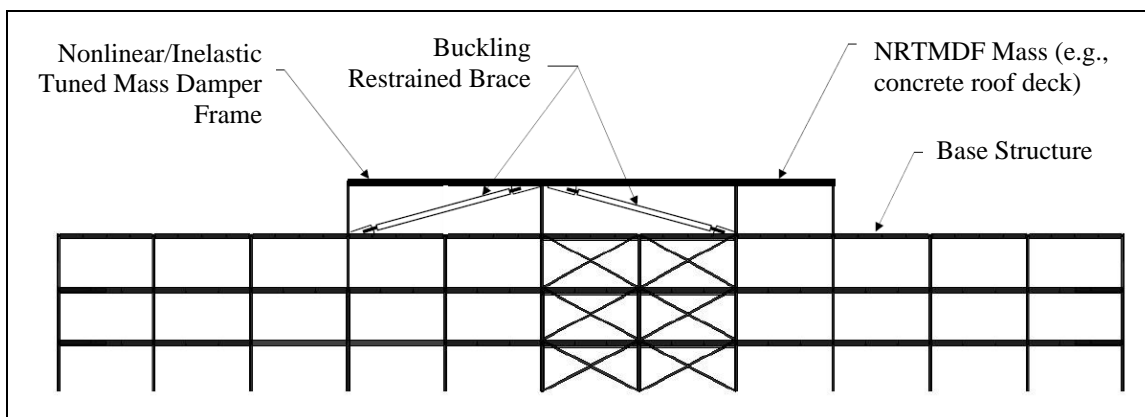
BRB Arrangements for Fail-Safe Stability
